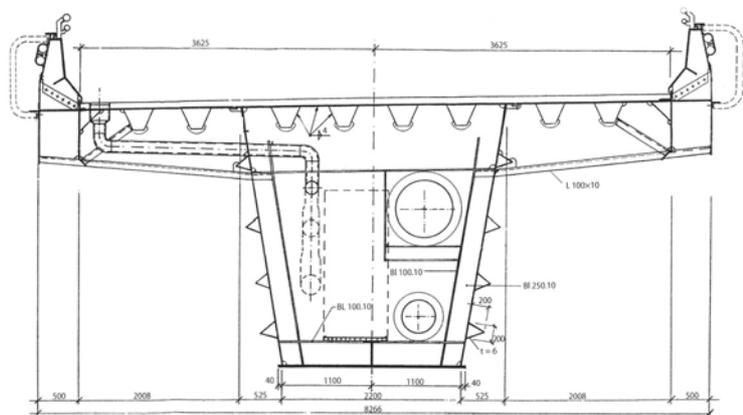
Constructional detail of the intersection “longitudinal stiffener and cross-frame”.
